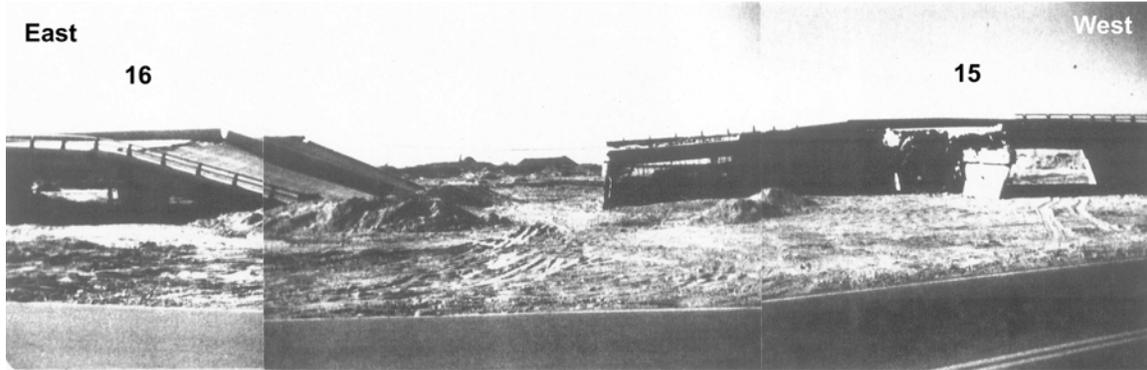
Photograph looking downstream (south) at failed bridge after February 26<sup>th</sup>.
